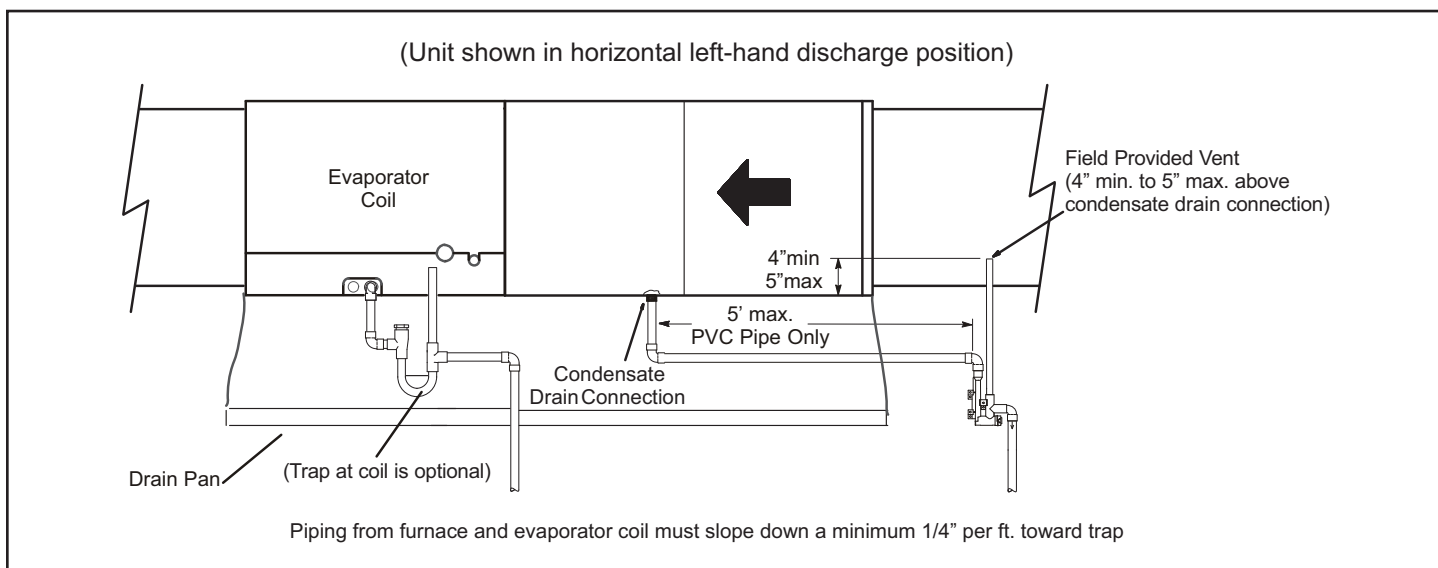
Furnace with Evaporator Coil Using a Separate Drain
